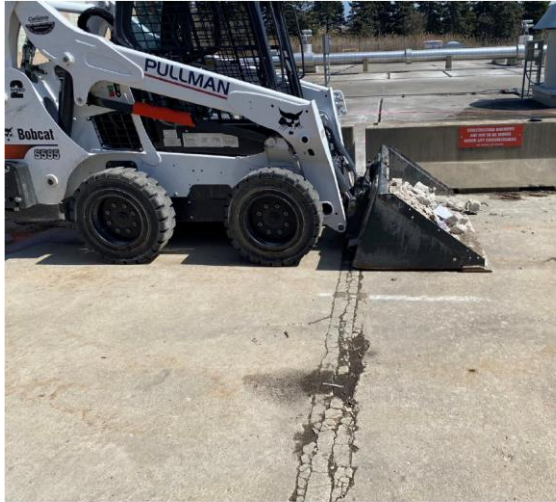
Spalled concrete around control joint west of Headworks Building.
